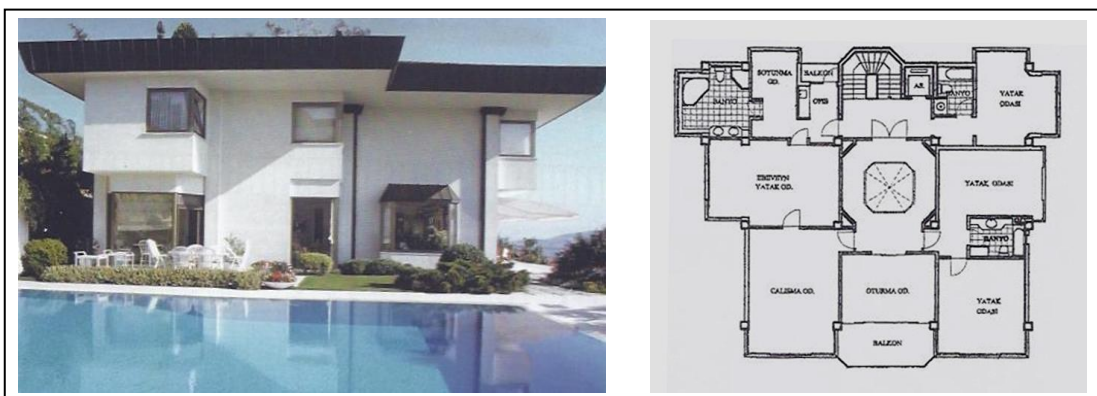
Left facade and floor plan of B. Atabay house [159] (p)
